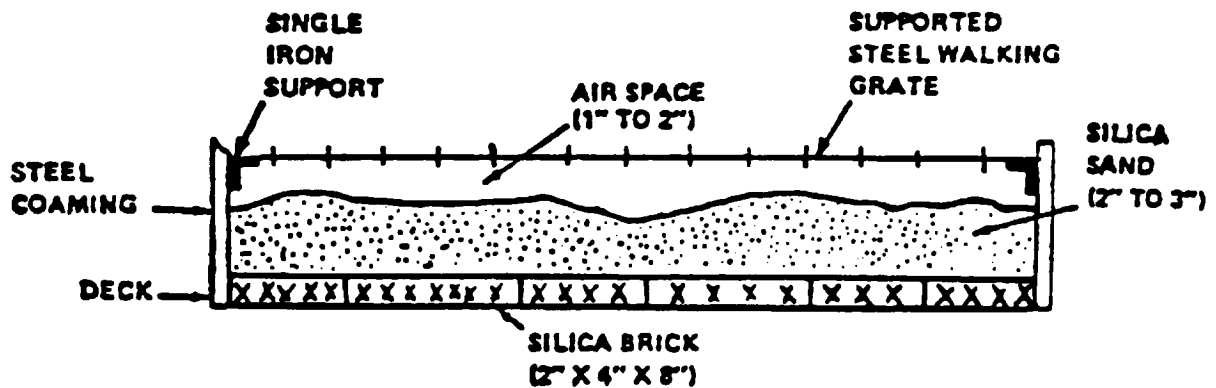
Cross-Sectional Sketch of Foundry Deck Installation
